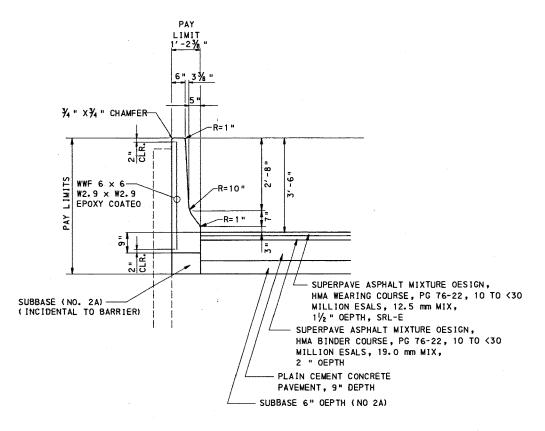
DETAIL - SINGLE FACE CONCRETE BARRIER TYPE 3
